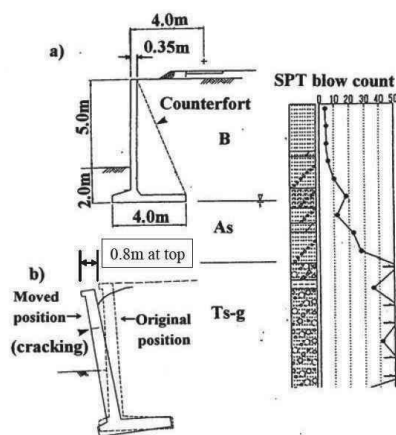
Damaged railway retaining wall after the 1995 Hyogoken-Nambu earthquake (Tatsuoka et al. 1998)
